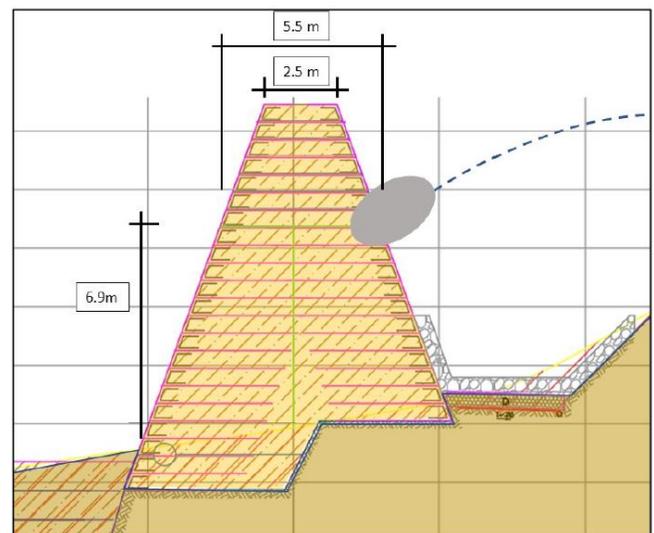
Static Barrier Embankment Scheme with Reinforced Soil Wall.
